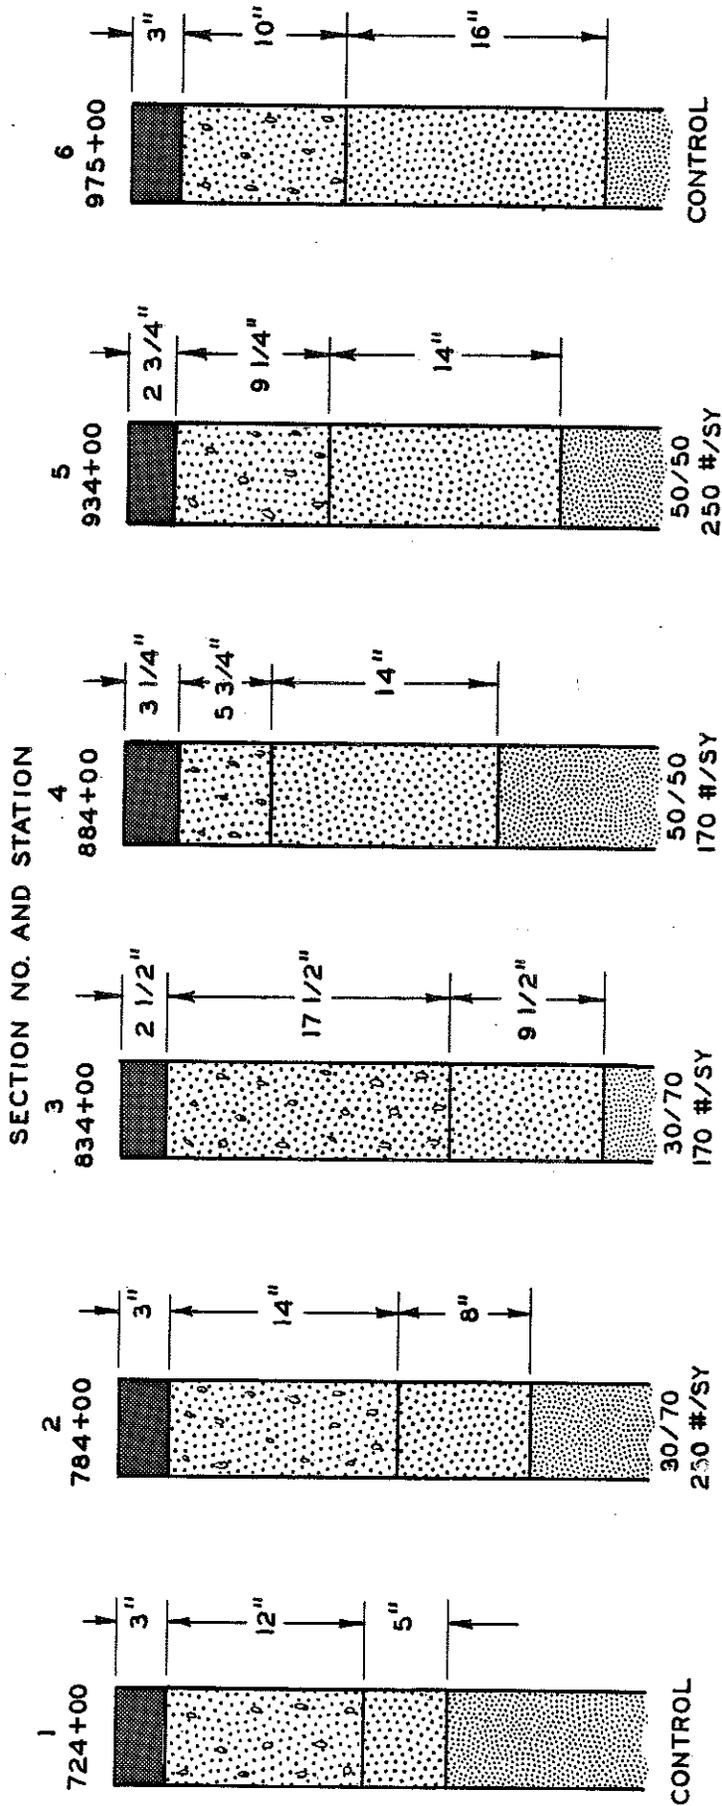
Pavement cross-section and boring logs for sulfur-extended-asphalt test sections.
